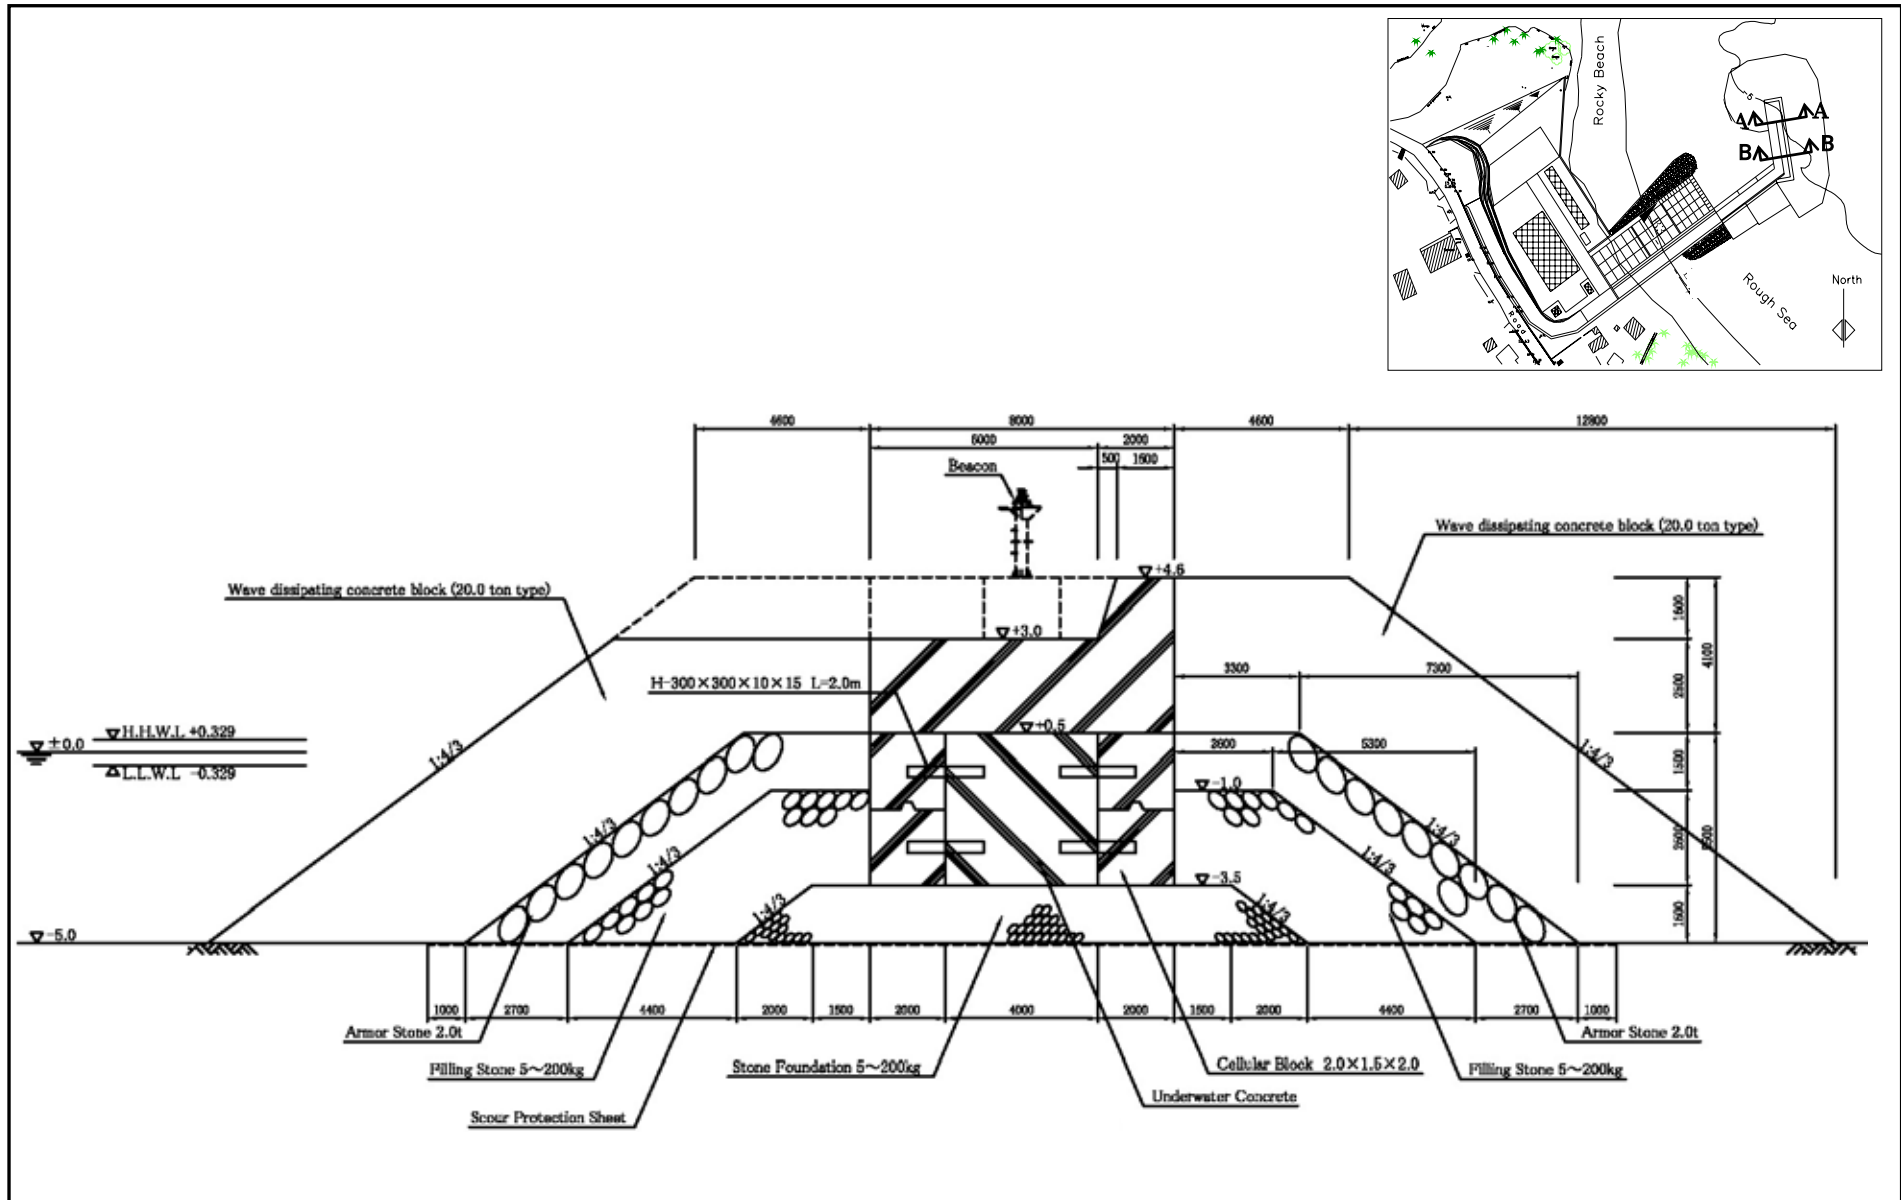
(2) Cross Section for Breakwater (Section A-A)
